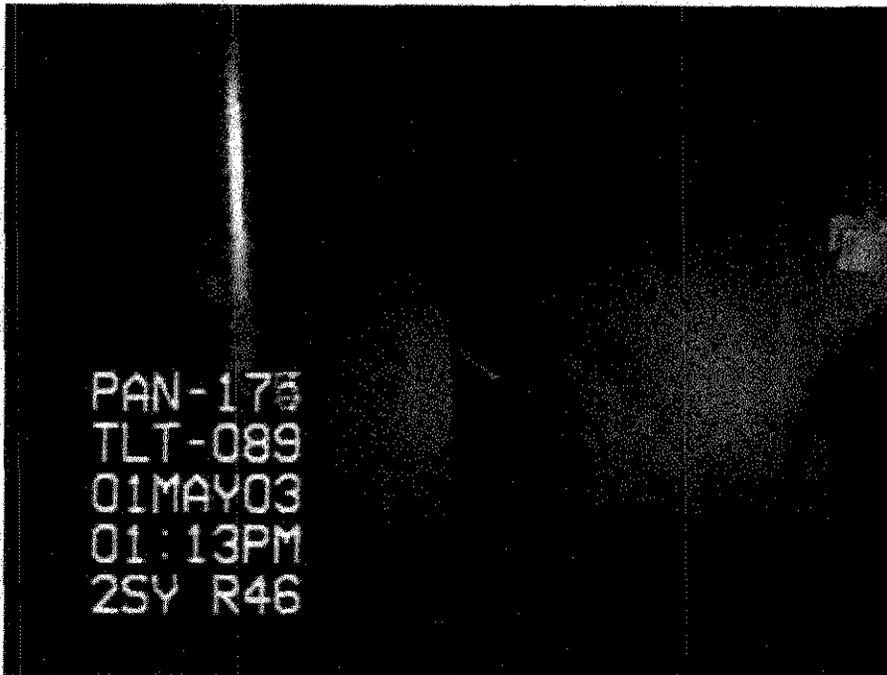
SY-102 Riser 46, Secondary Tank Wall (Right, 2003)
